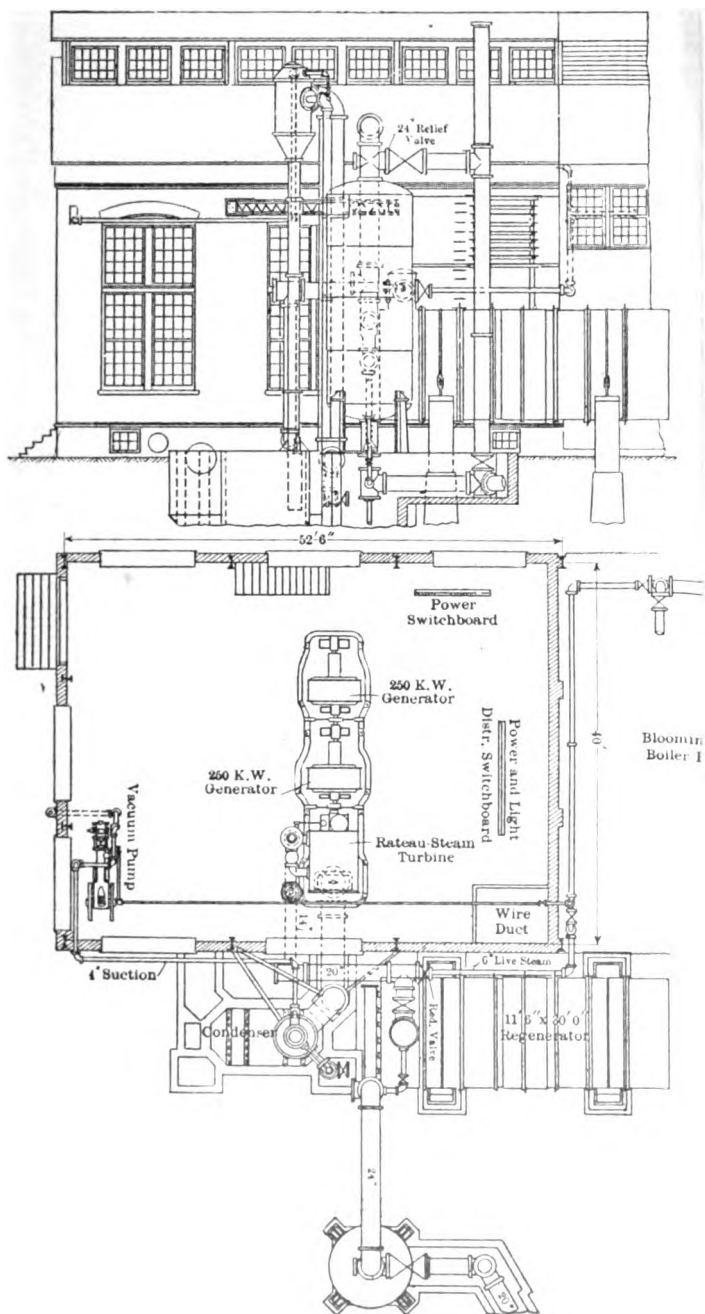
PLAN AND ELEVATIONS OF LOW-PRESS
